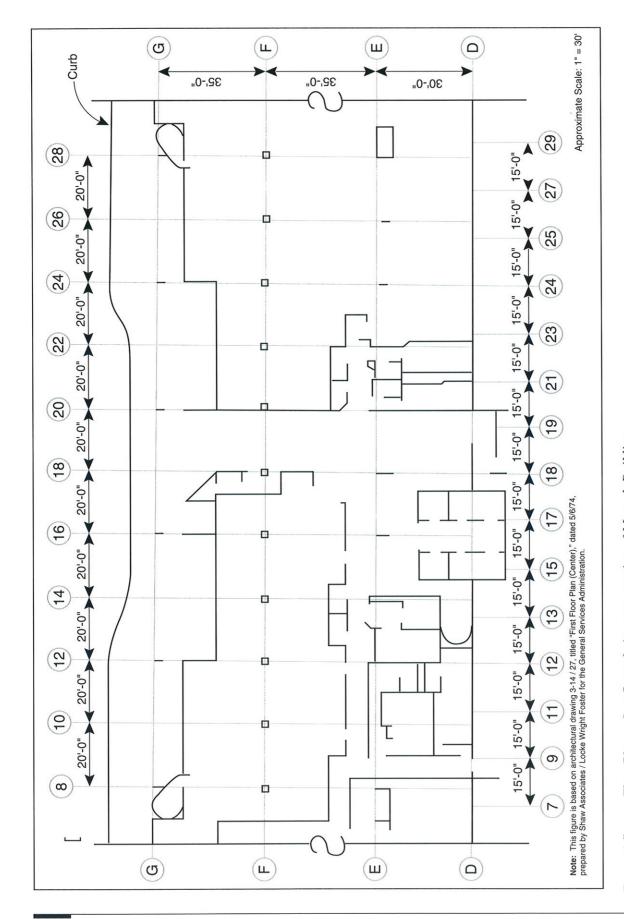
Floor Plan – first floor of nine-story portion of Murrah Building.
